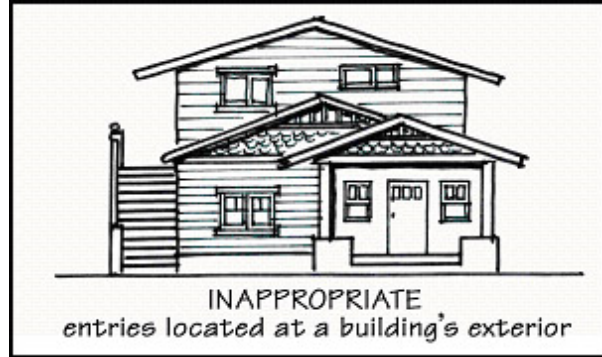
Avoid locating second floor access from the exterior of a structure
